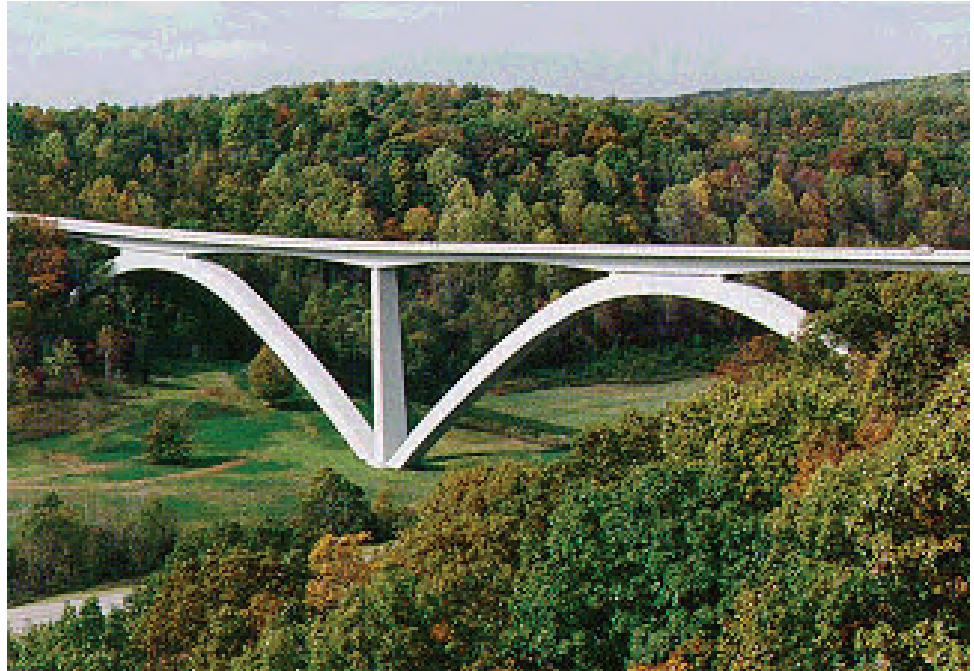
Precast Post-tensioned Concrete Arch without Spandrel Columns
